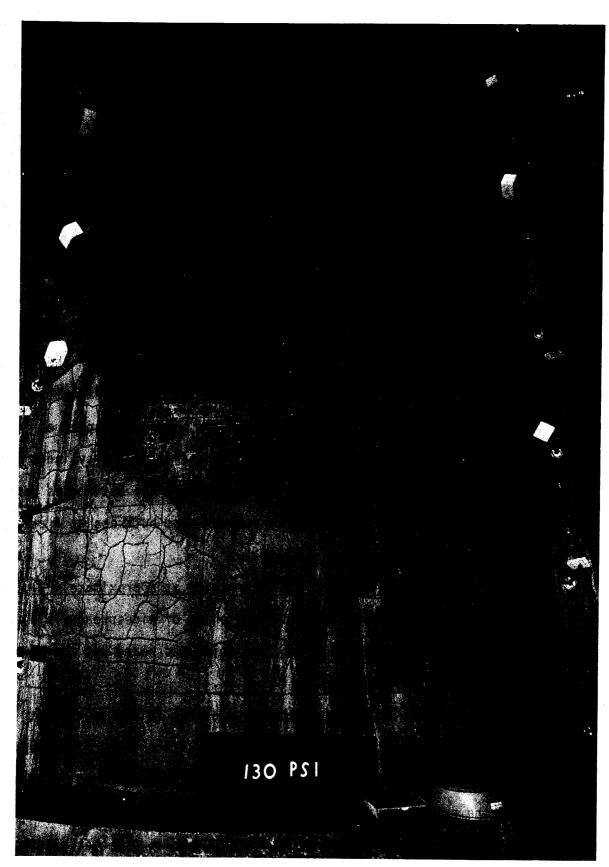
Cracking in West Wall at 130 psi
